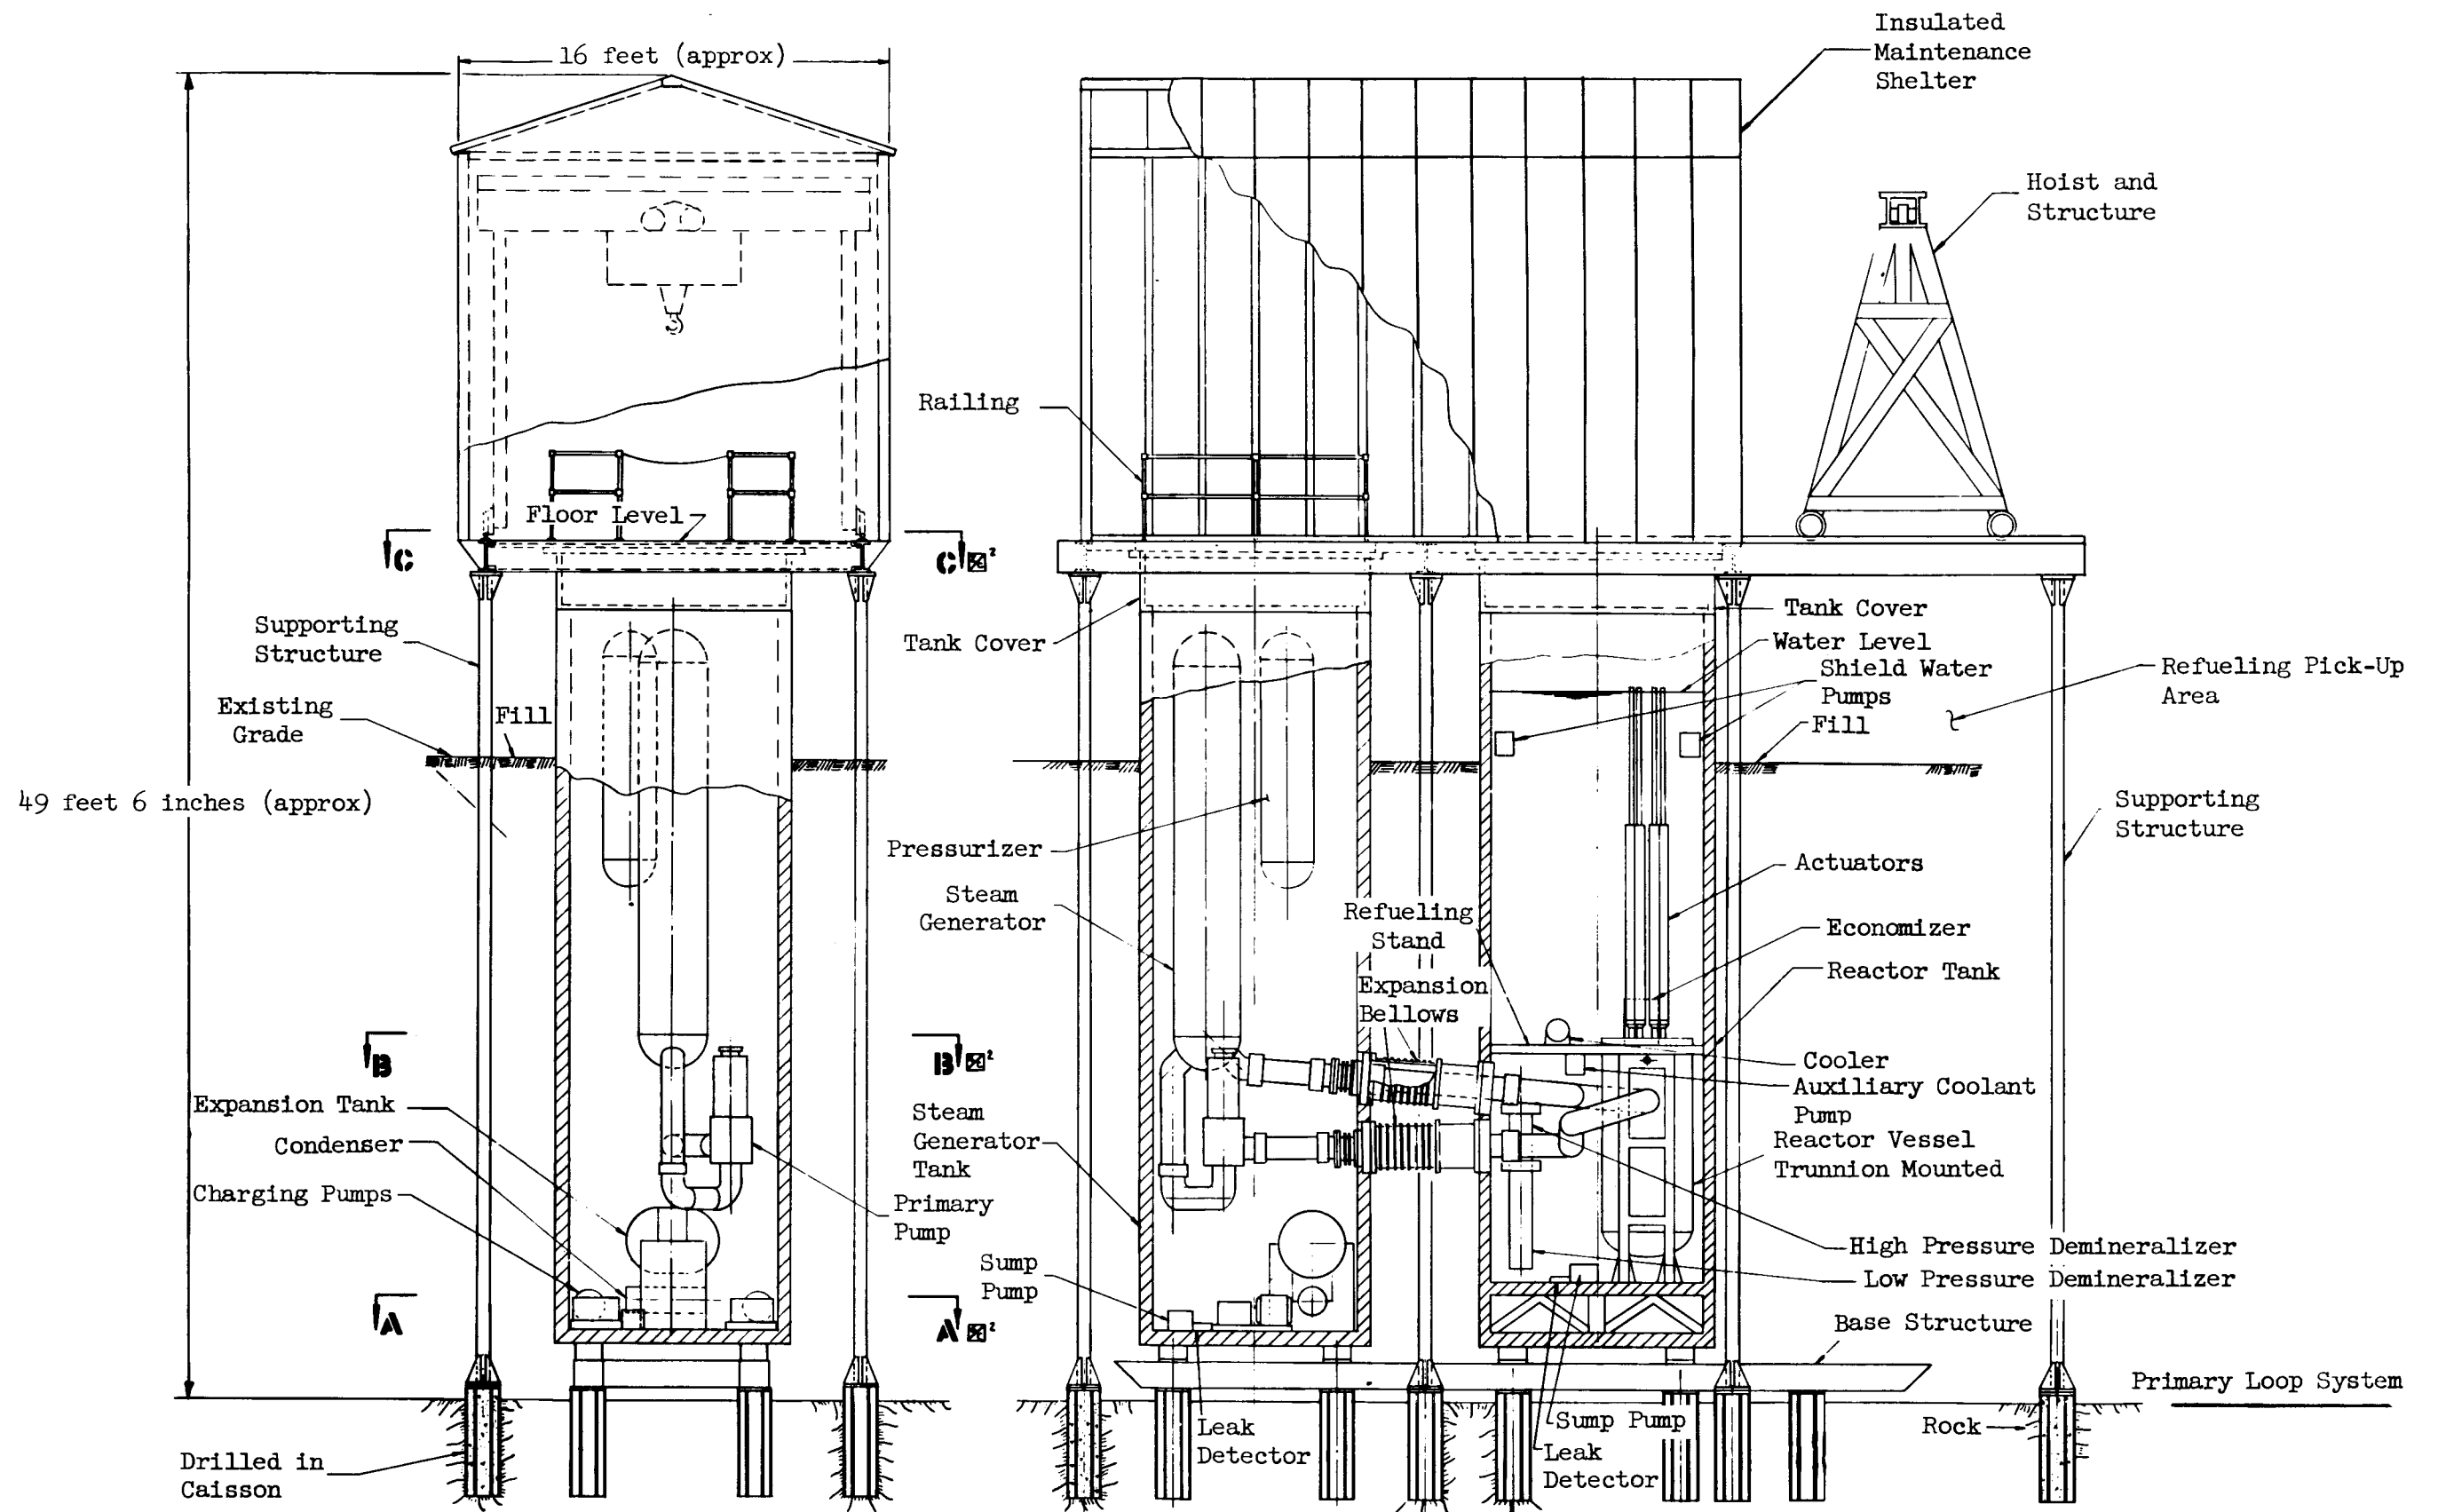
Plant Elevations--PM-1 Primary System and Housing
